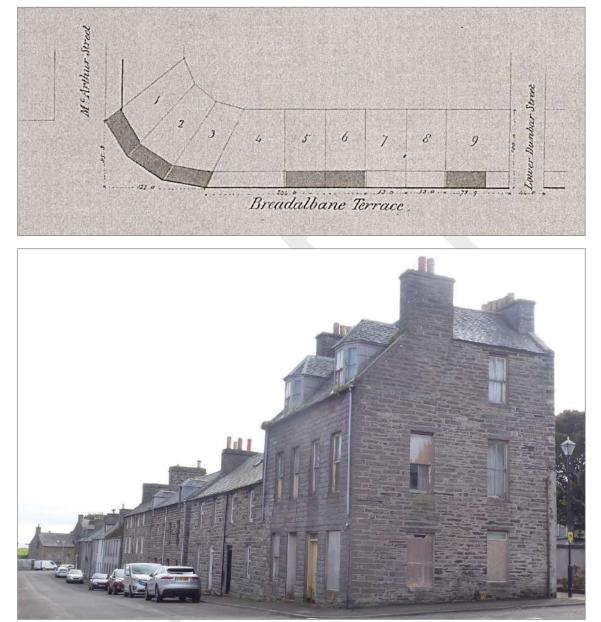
the Draft Feu Plan for the east side of Breadalbane Terrace and below the development on those lots. Note the larger scale of the corner building in comparison to its neighbour, shaded on the plan (lot 9) and one of the earliest buildings on the terrace constructed by 1813. The incline of the site has allowed progressively taller buildings to the east ending in the 3-storey at Nos 22-23. © SRO/GD9/337/1
